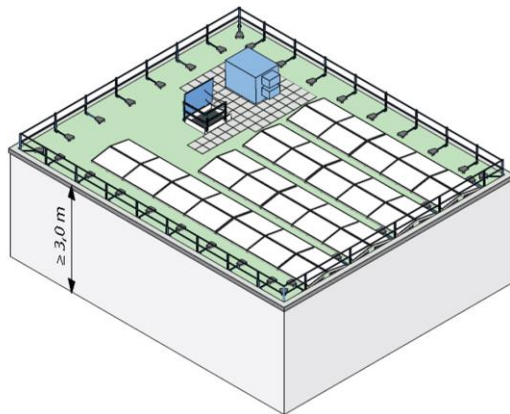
Schematic diagram of collective security (source: [Building Envelope Switzerland])
